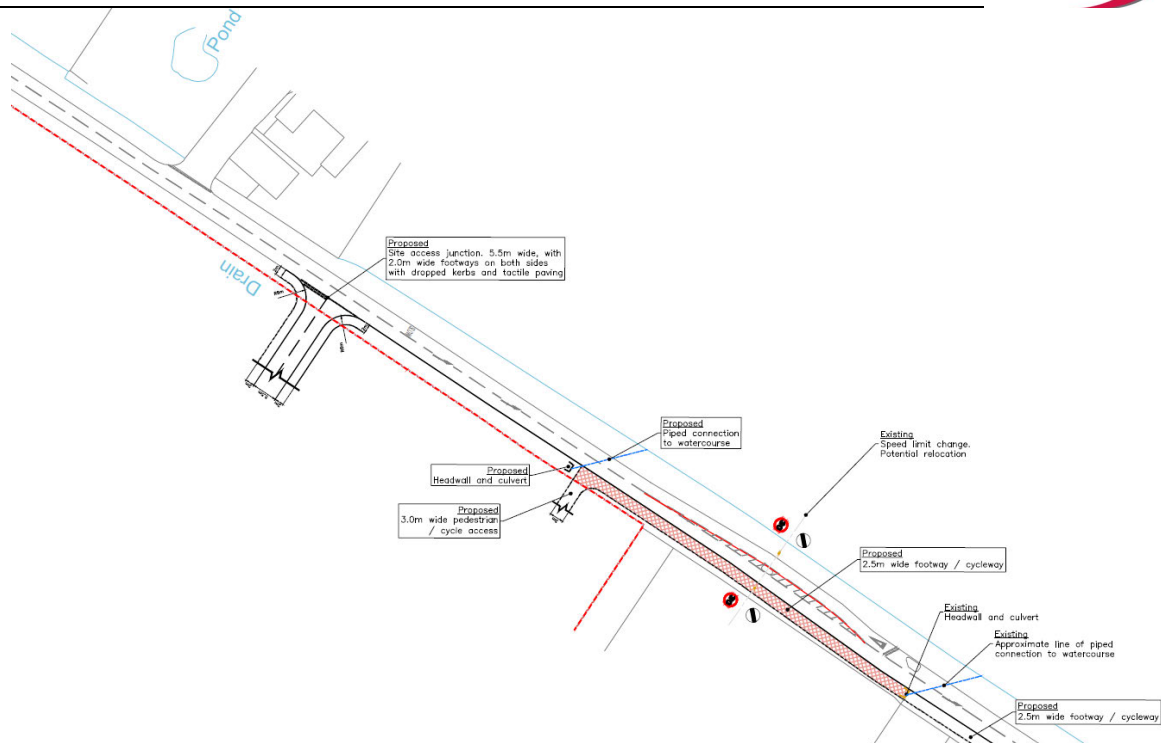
Proposed footway extension to the west of Long Road (TPA)
